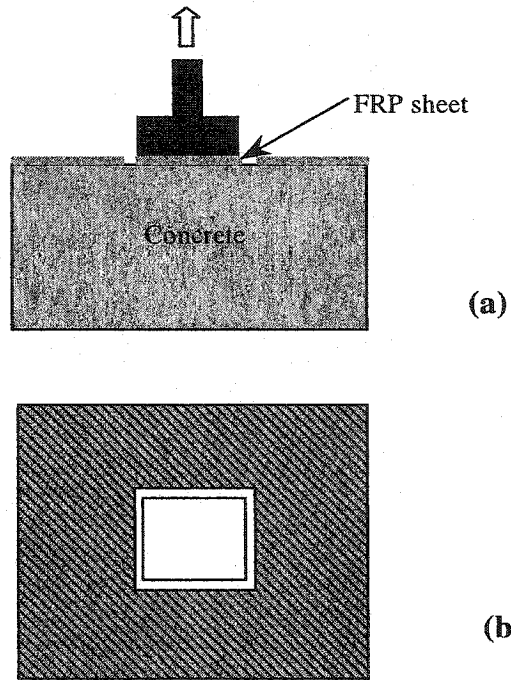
Direct tension bond test (a) elevation (b) plan view
